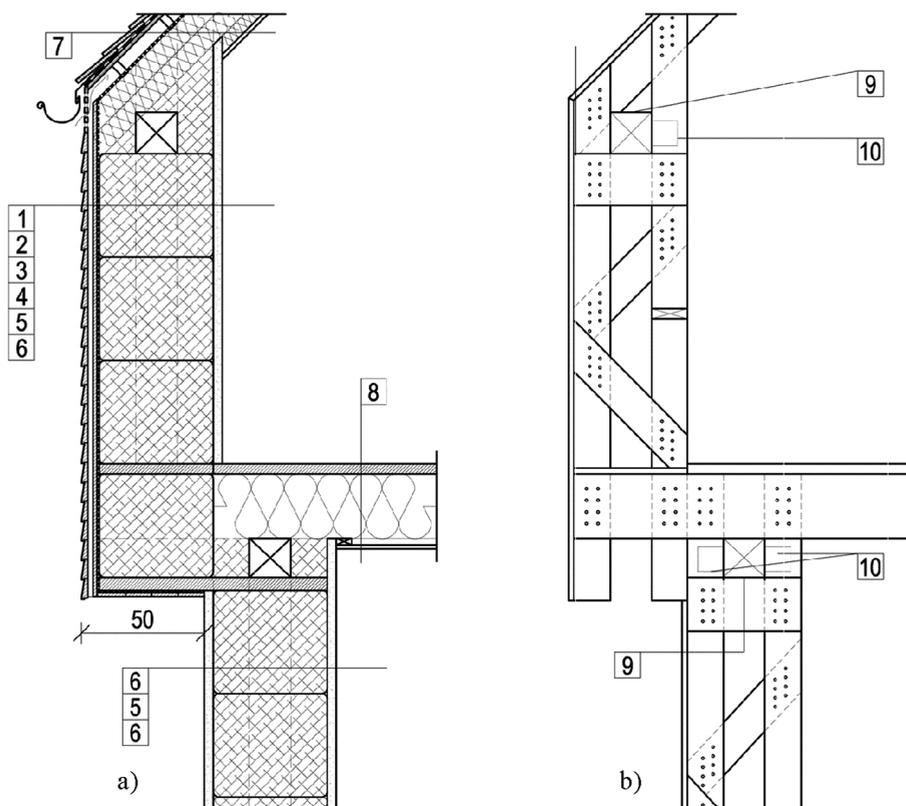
Detail of first floor wall overhanged towards ground floor wall: a) finished wall, b) wooden structure made from boards connected with nails; 1 – wooden shingle, 2 – ventilated air gap, 3 – planking, 4 – wind insulation, 5 – straw bales and wooden structure, 6 – clay plaster, 7 – roof layers, 8 – ceiling layers, 9 – beam, 10 – angle bracket
